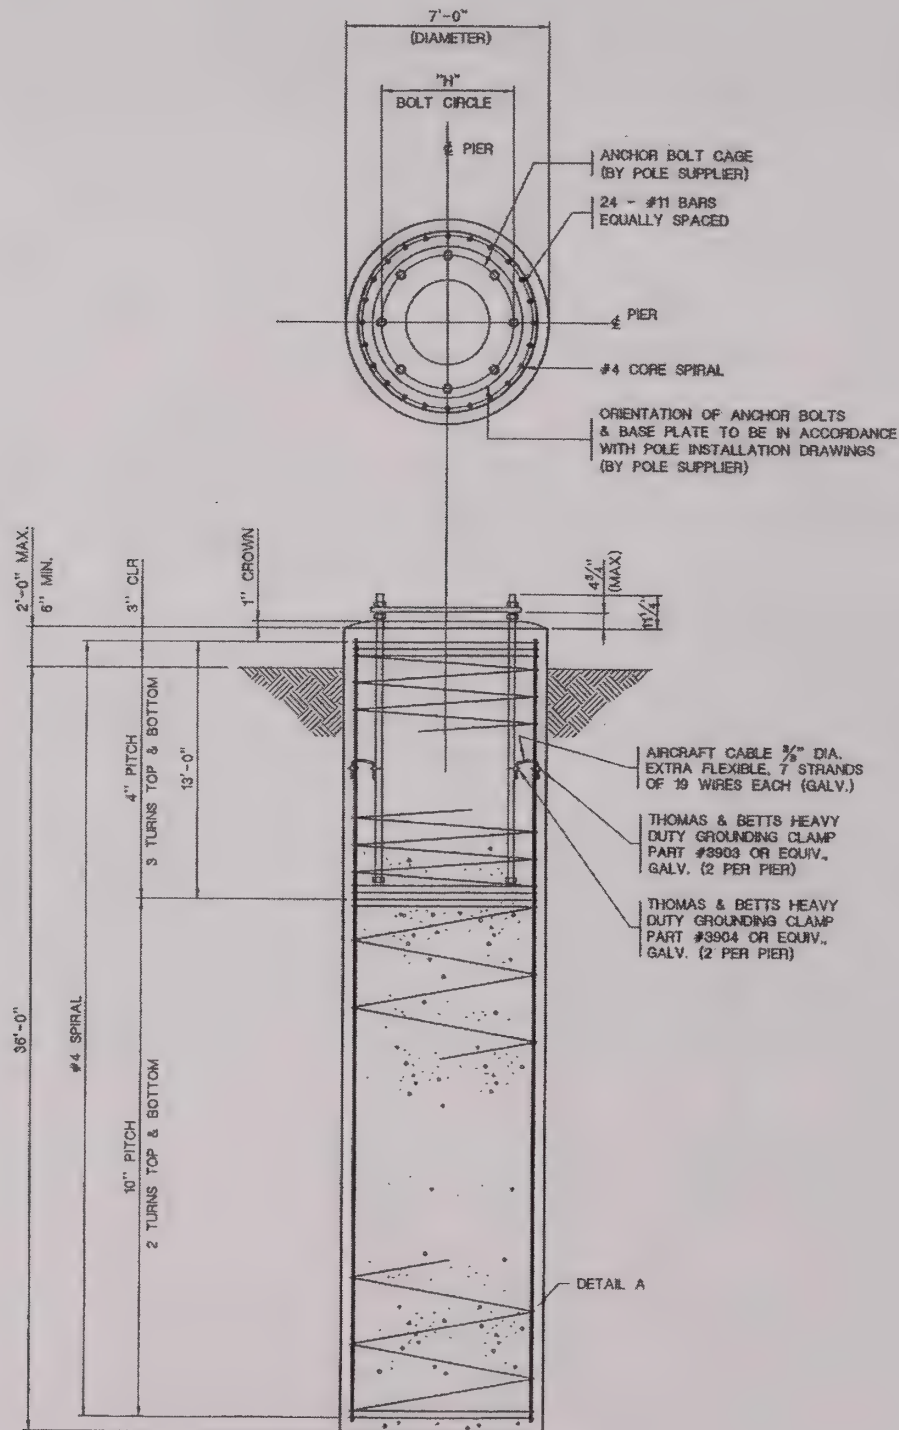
TYPICAL FOUNDATION DESIGN FOR TUBULAR STEEL POLES
